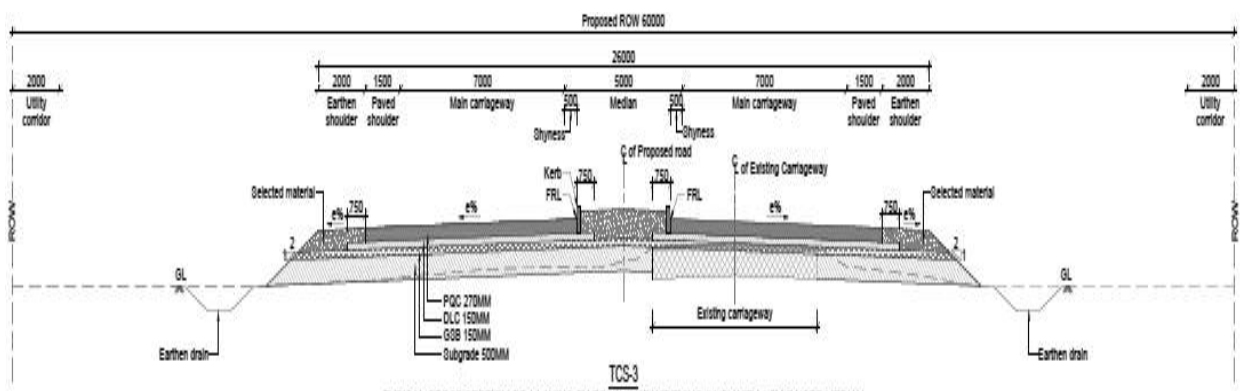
TCS-3 (Typical Cross Section Of 4-Laning By Eccentric Widening (LHS) With 4.0m Raised Median
